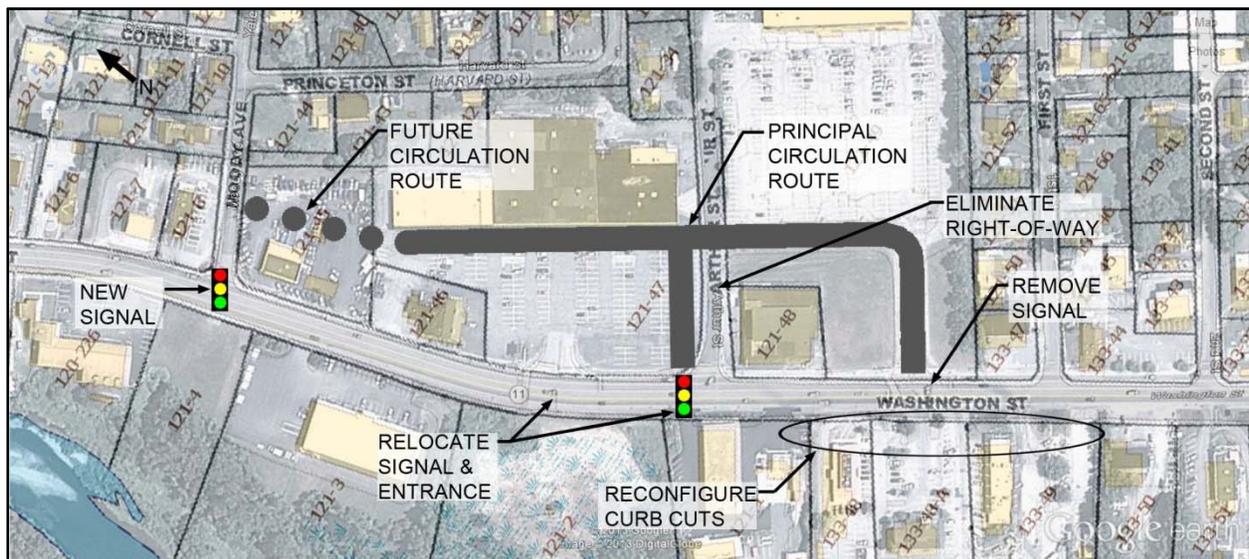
Schematic Plan for Revised Signal and Circulation Plan, Claremont Plaza
